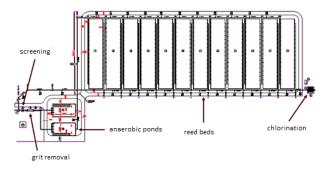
Unit arrangement at Qasr-e Shirin wastewater treatment
